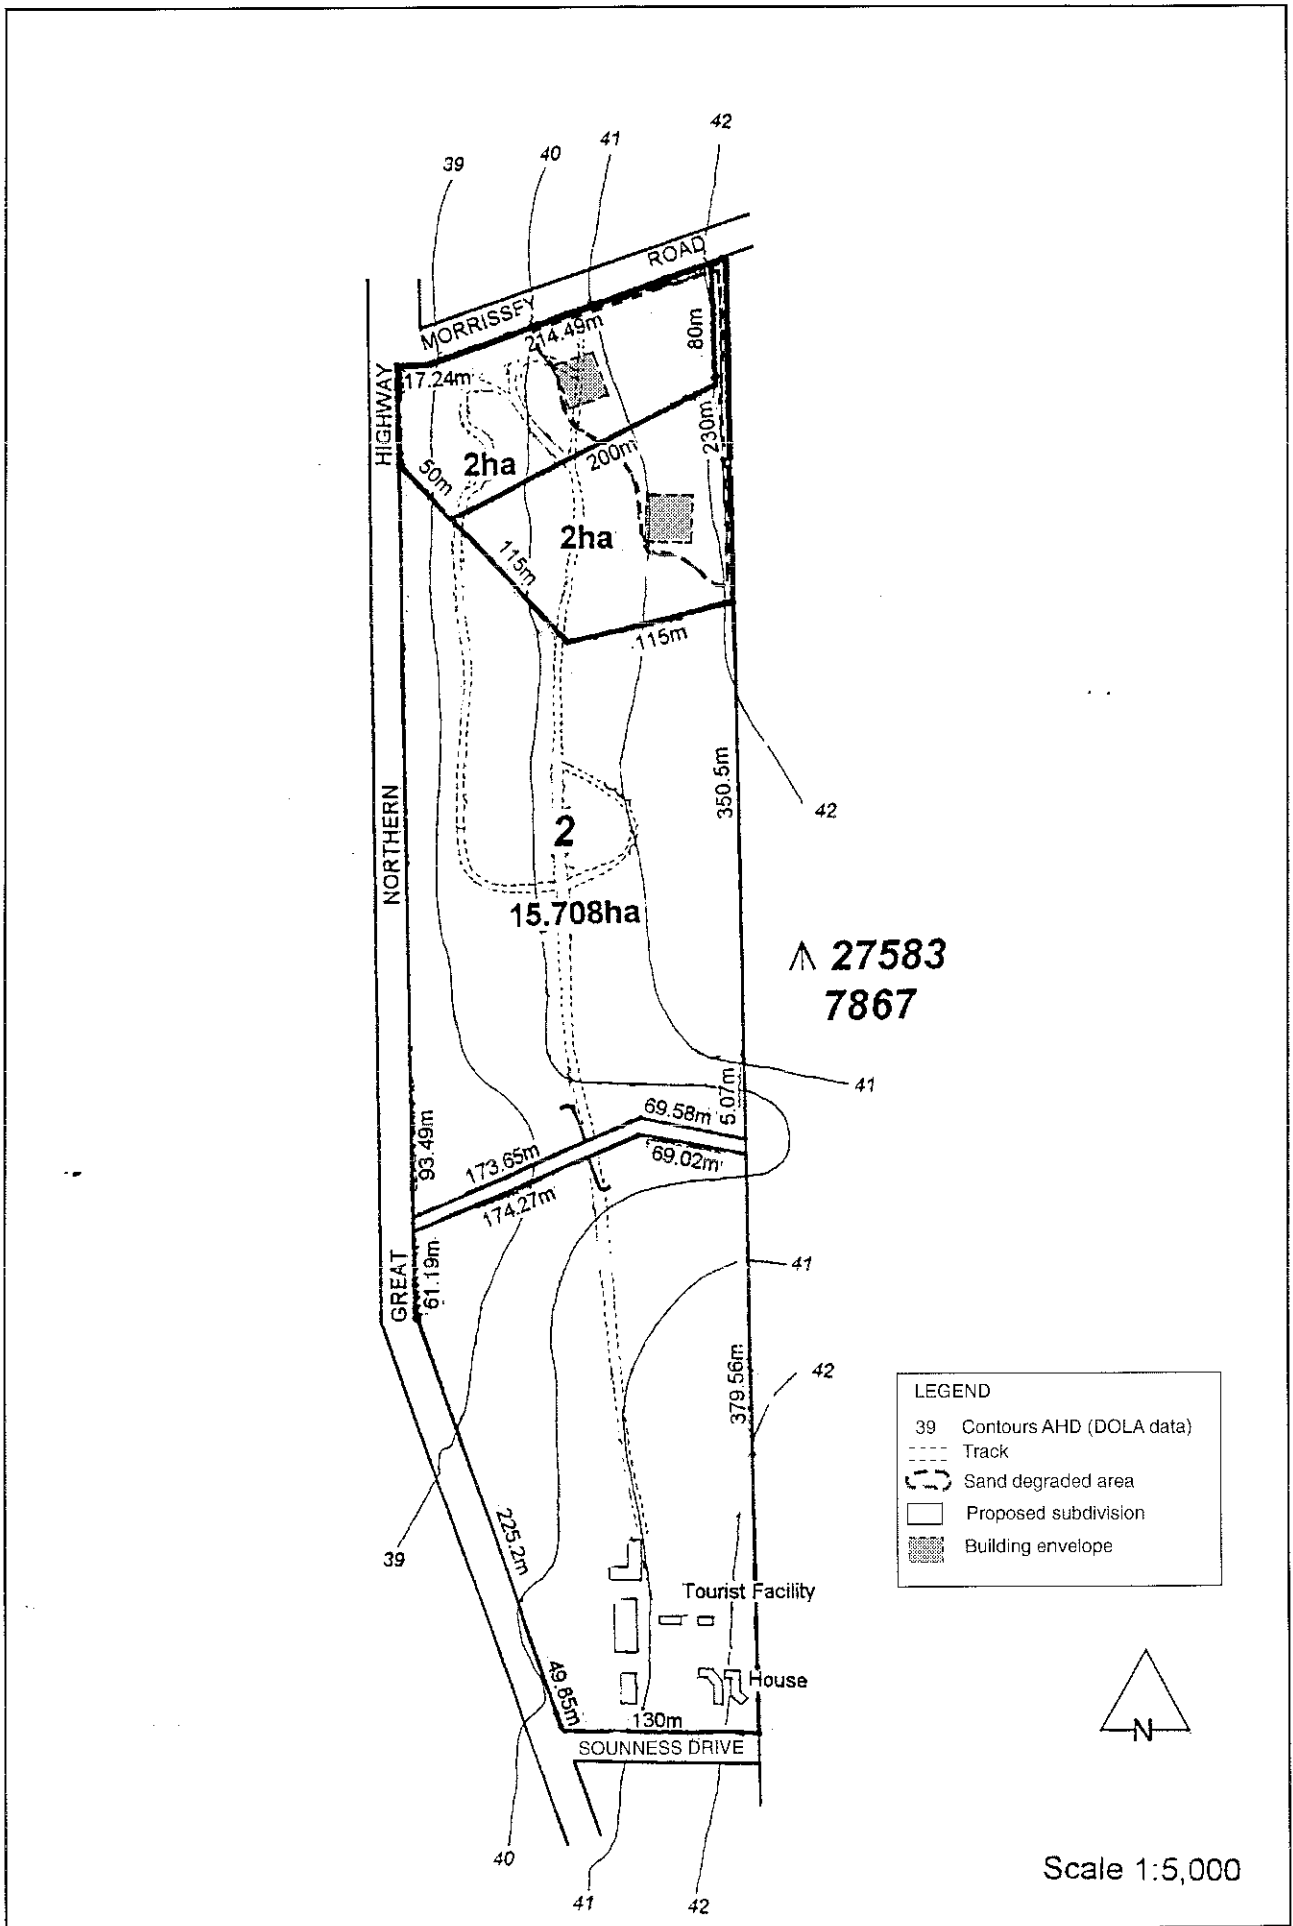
Modified subdivision proposal (Adapted from Ray Belton Planning).
